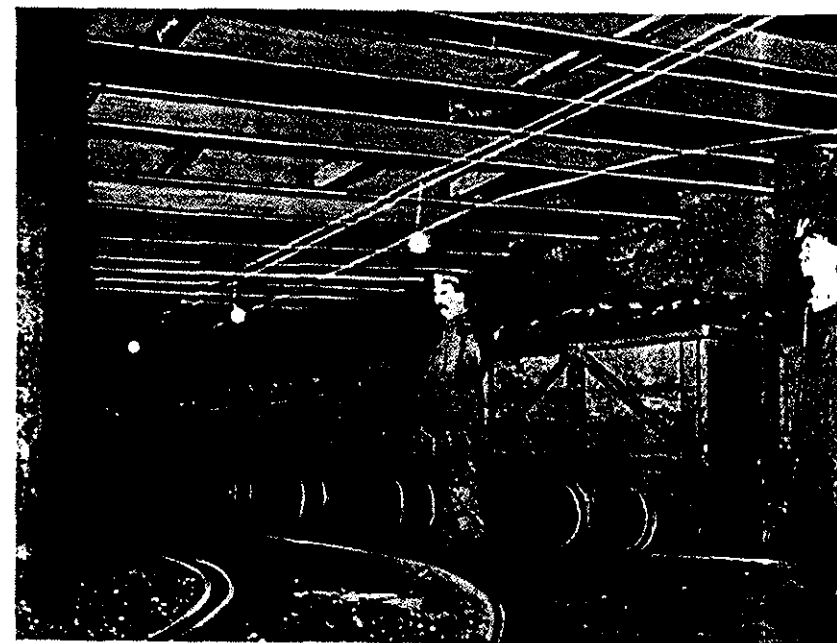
Shaft bottom with roof supported by steel I-beams set on concrete walls (photo by R. V. Williams, U. S. Bureau of Mines)
